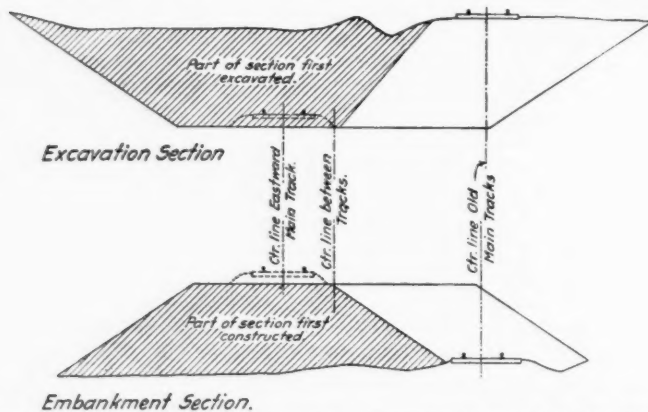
Typical Cross Sections, Showing Method of Making Offset Location.
